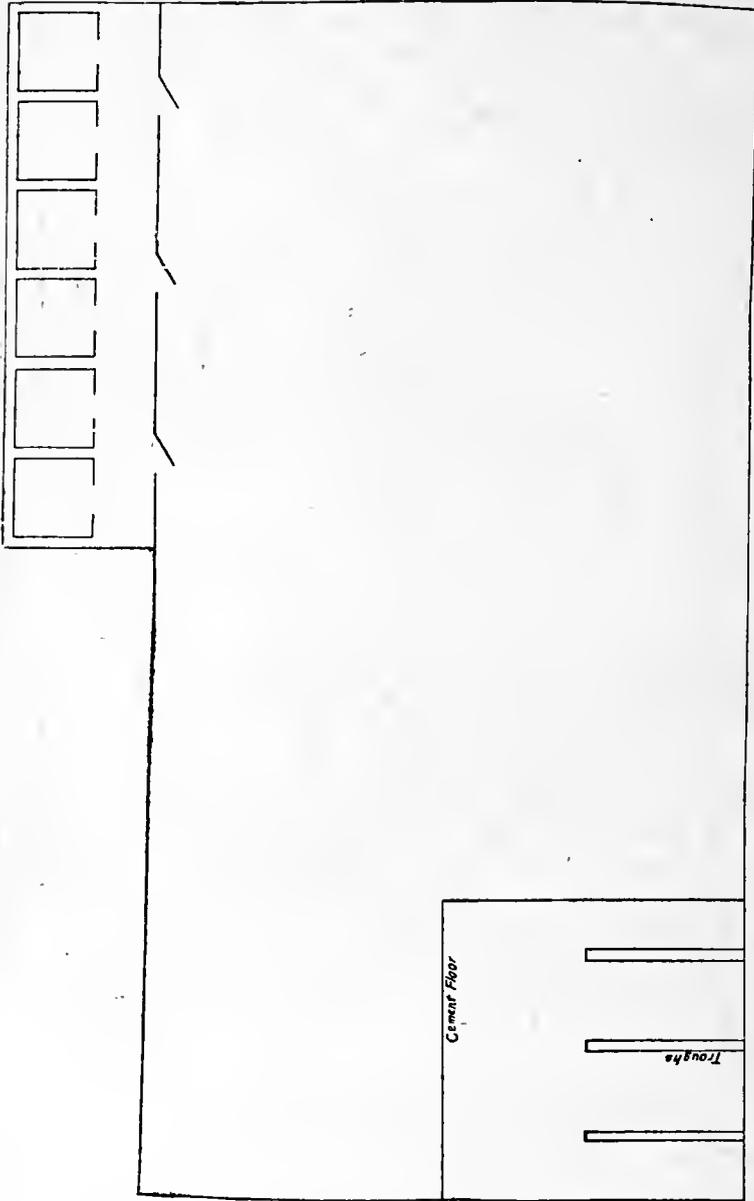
Yard Plan for Movable Hog House and Feeding Floor.
